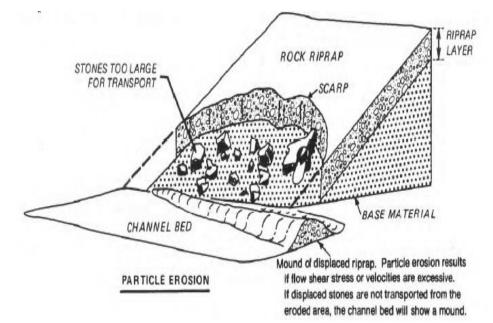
Failure of Riprap Slope Due to Erosion (Blodget & McConaughy, 1986).
